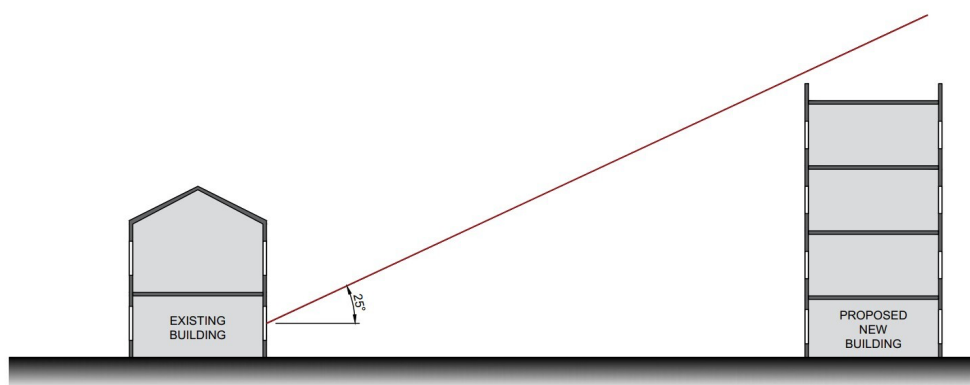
25° Angle test for Daylight Impact to Existing Buildings
